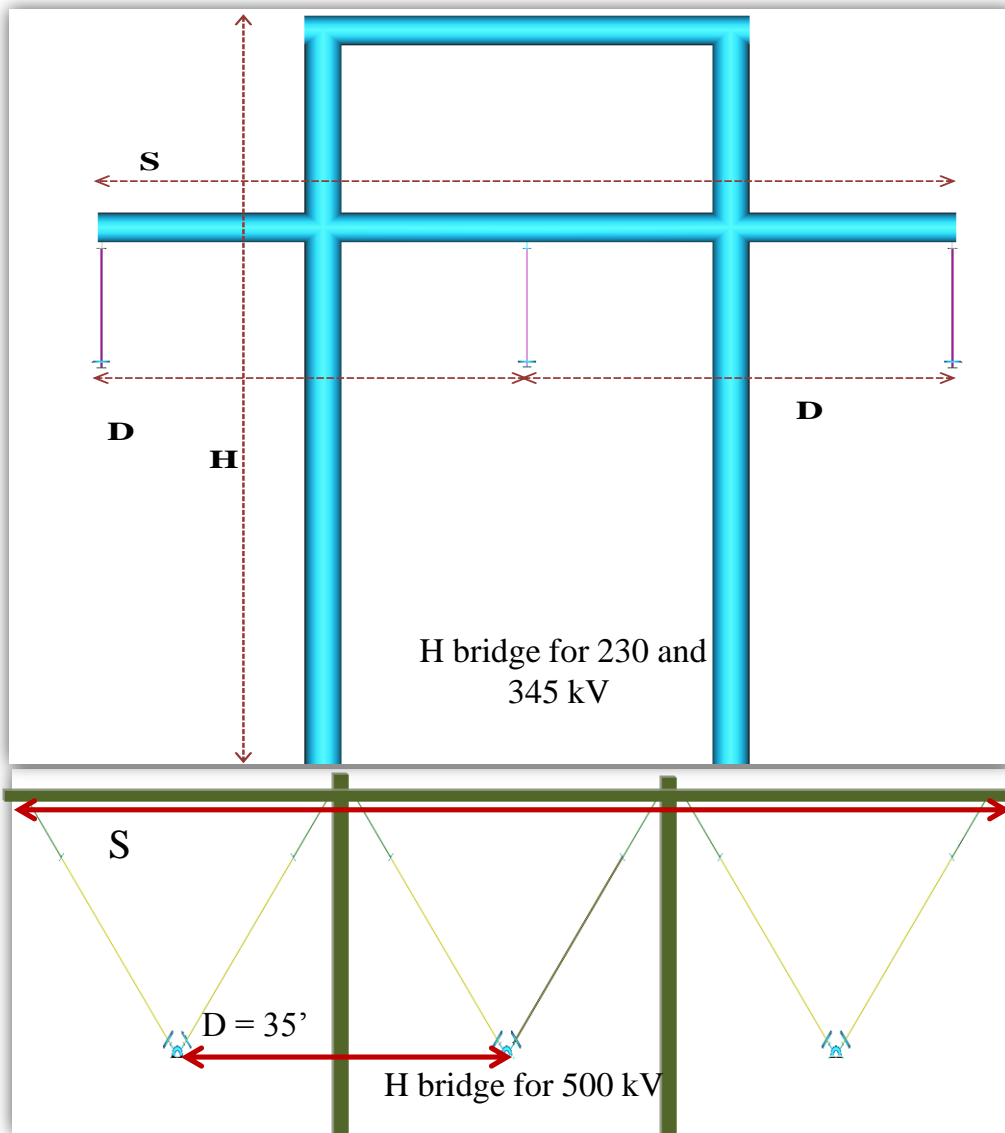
Dimensions for 230 kV, 345 kV H bridge I string and 500 kV V string tower
